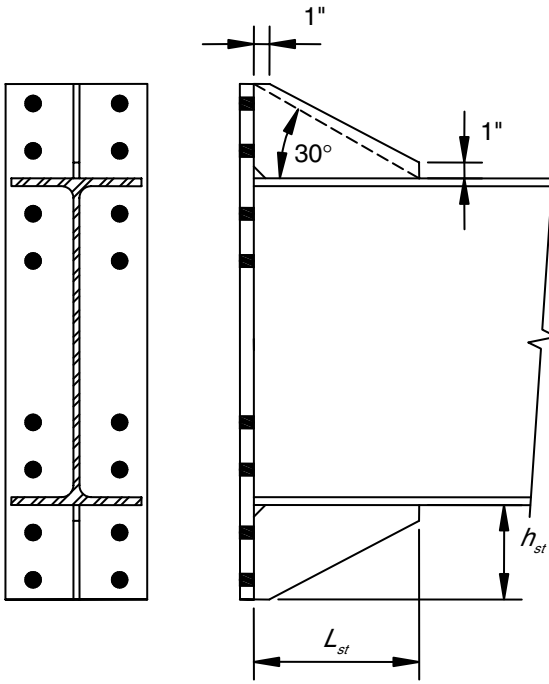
End-plate stiffener layout and geometry (8ES)
